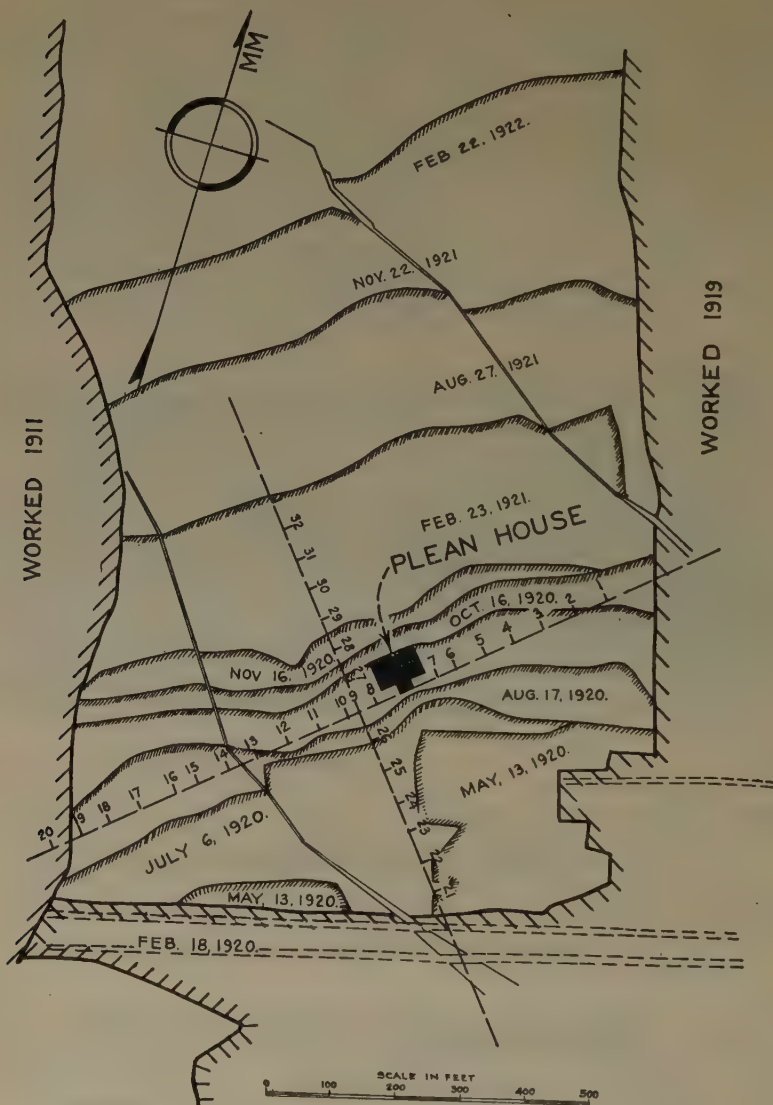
PLAN OF 20-INCH WORKINGS.
